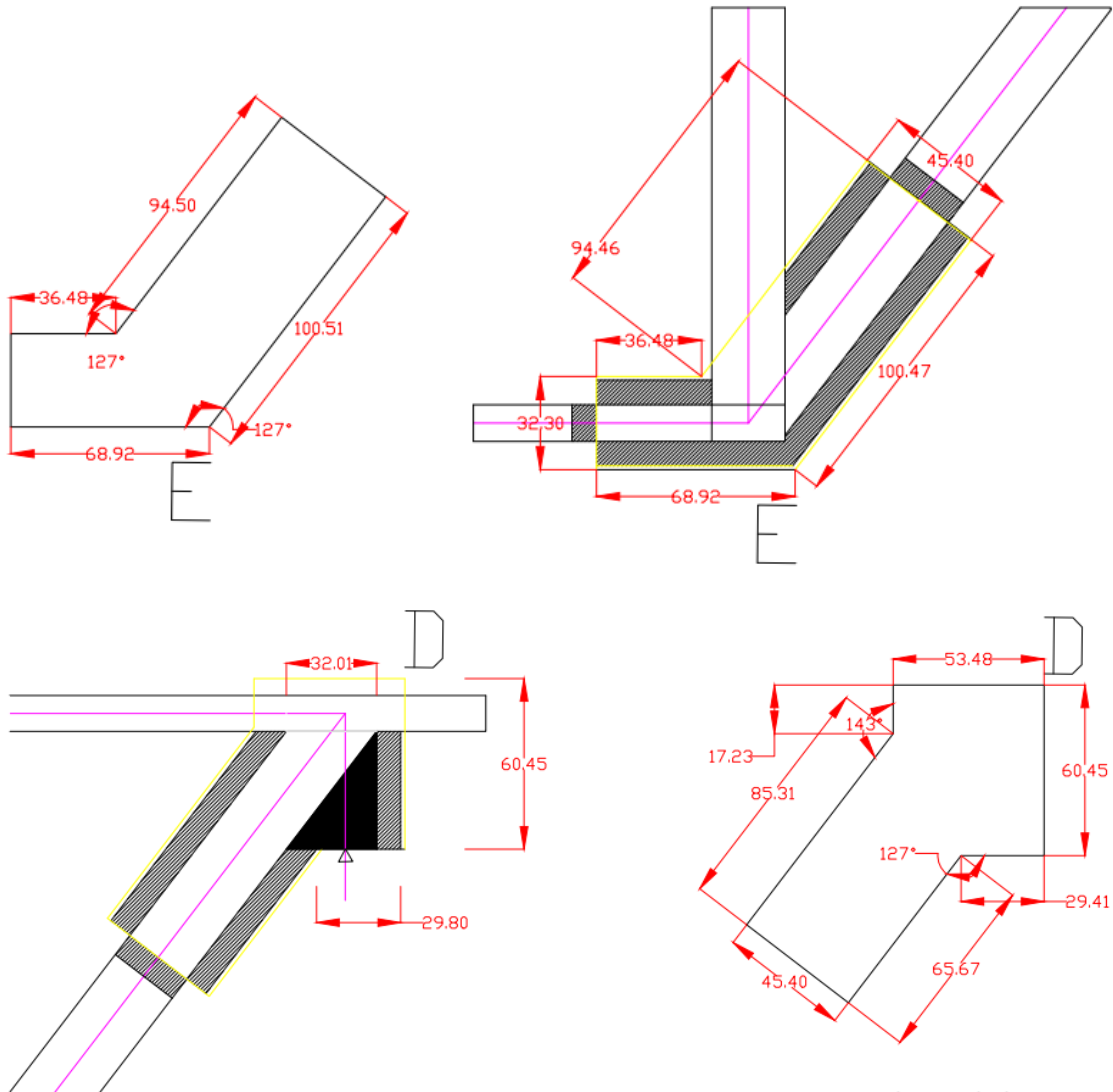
Plates and weld dimensions for joints E and D
